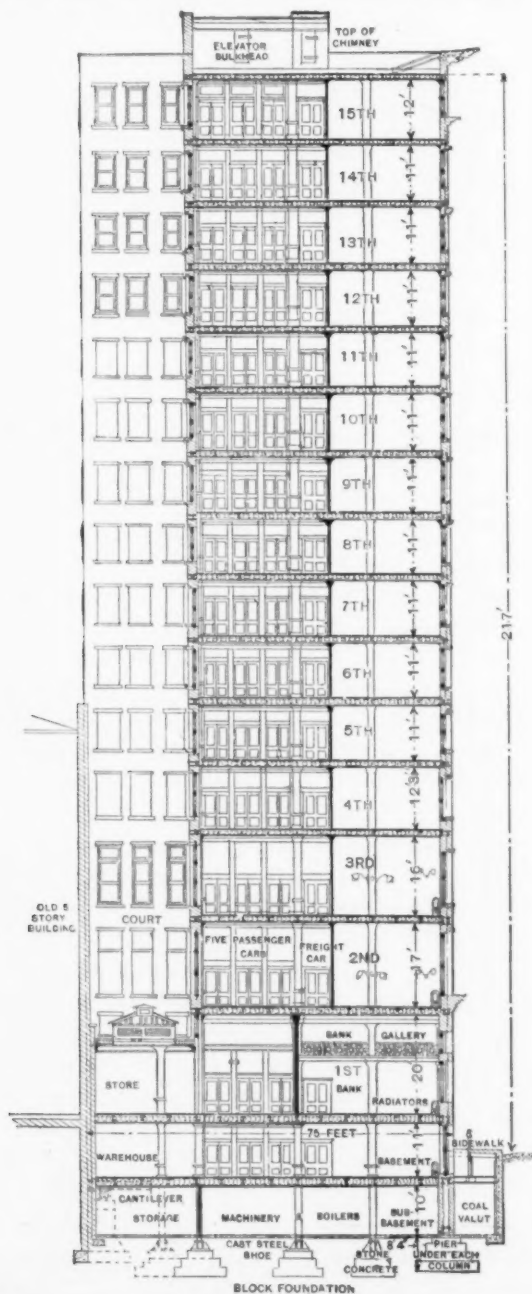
SECTIONAL ELEVATION OF A TYPICAL COMMERCIAL SKY-SCRAPER.
